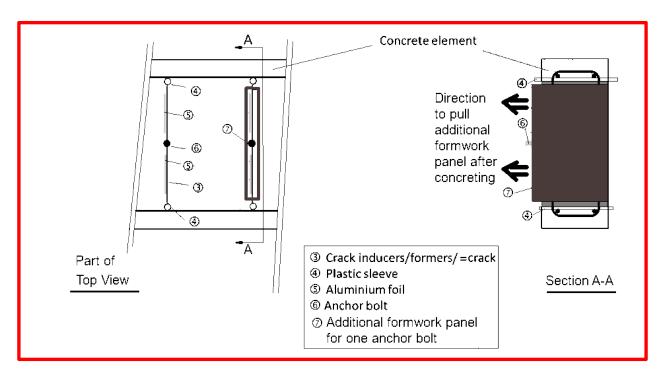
Example for additional formwork for one anchor bolt and pulling direction
